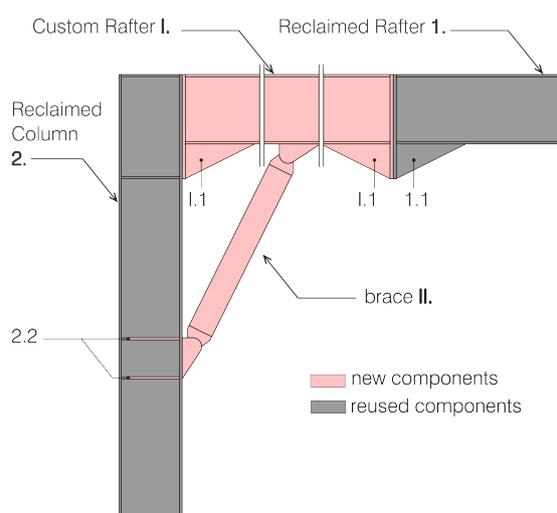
Outline of beam-to-column custom connector used for rafter extension
